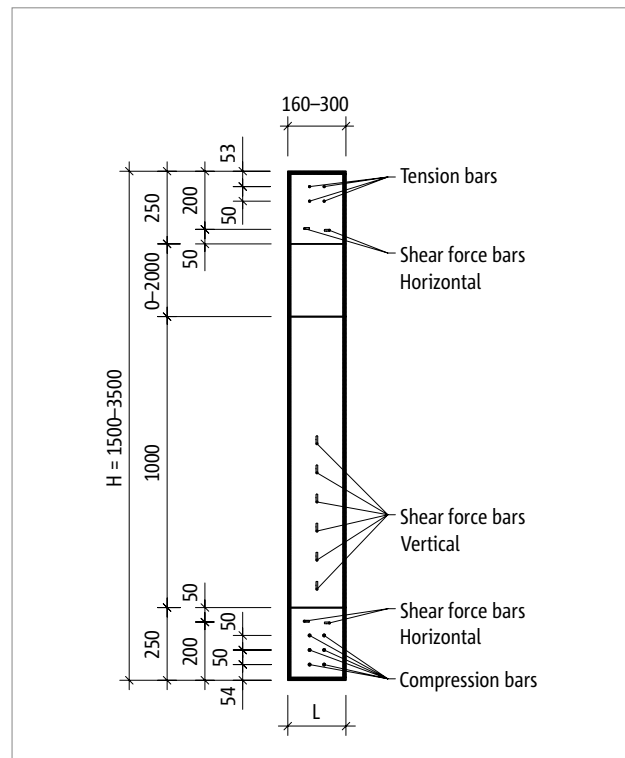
Schöck Isokorb® T type W-M1-R90: Product layout; perimeter fire protection boards
